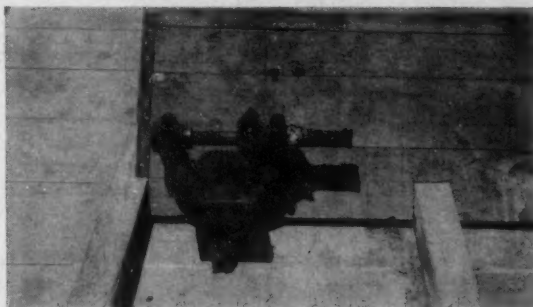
One of two sets of bevel gears and frame used to transfer power through the deck, center bearing and turntable.
